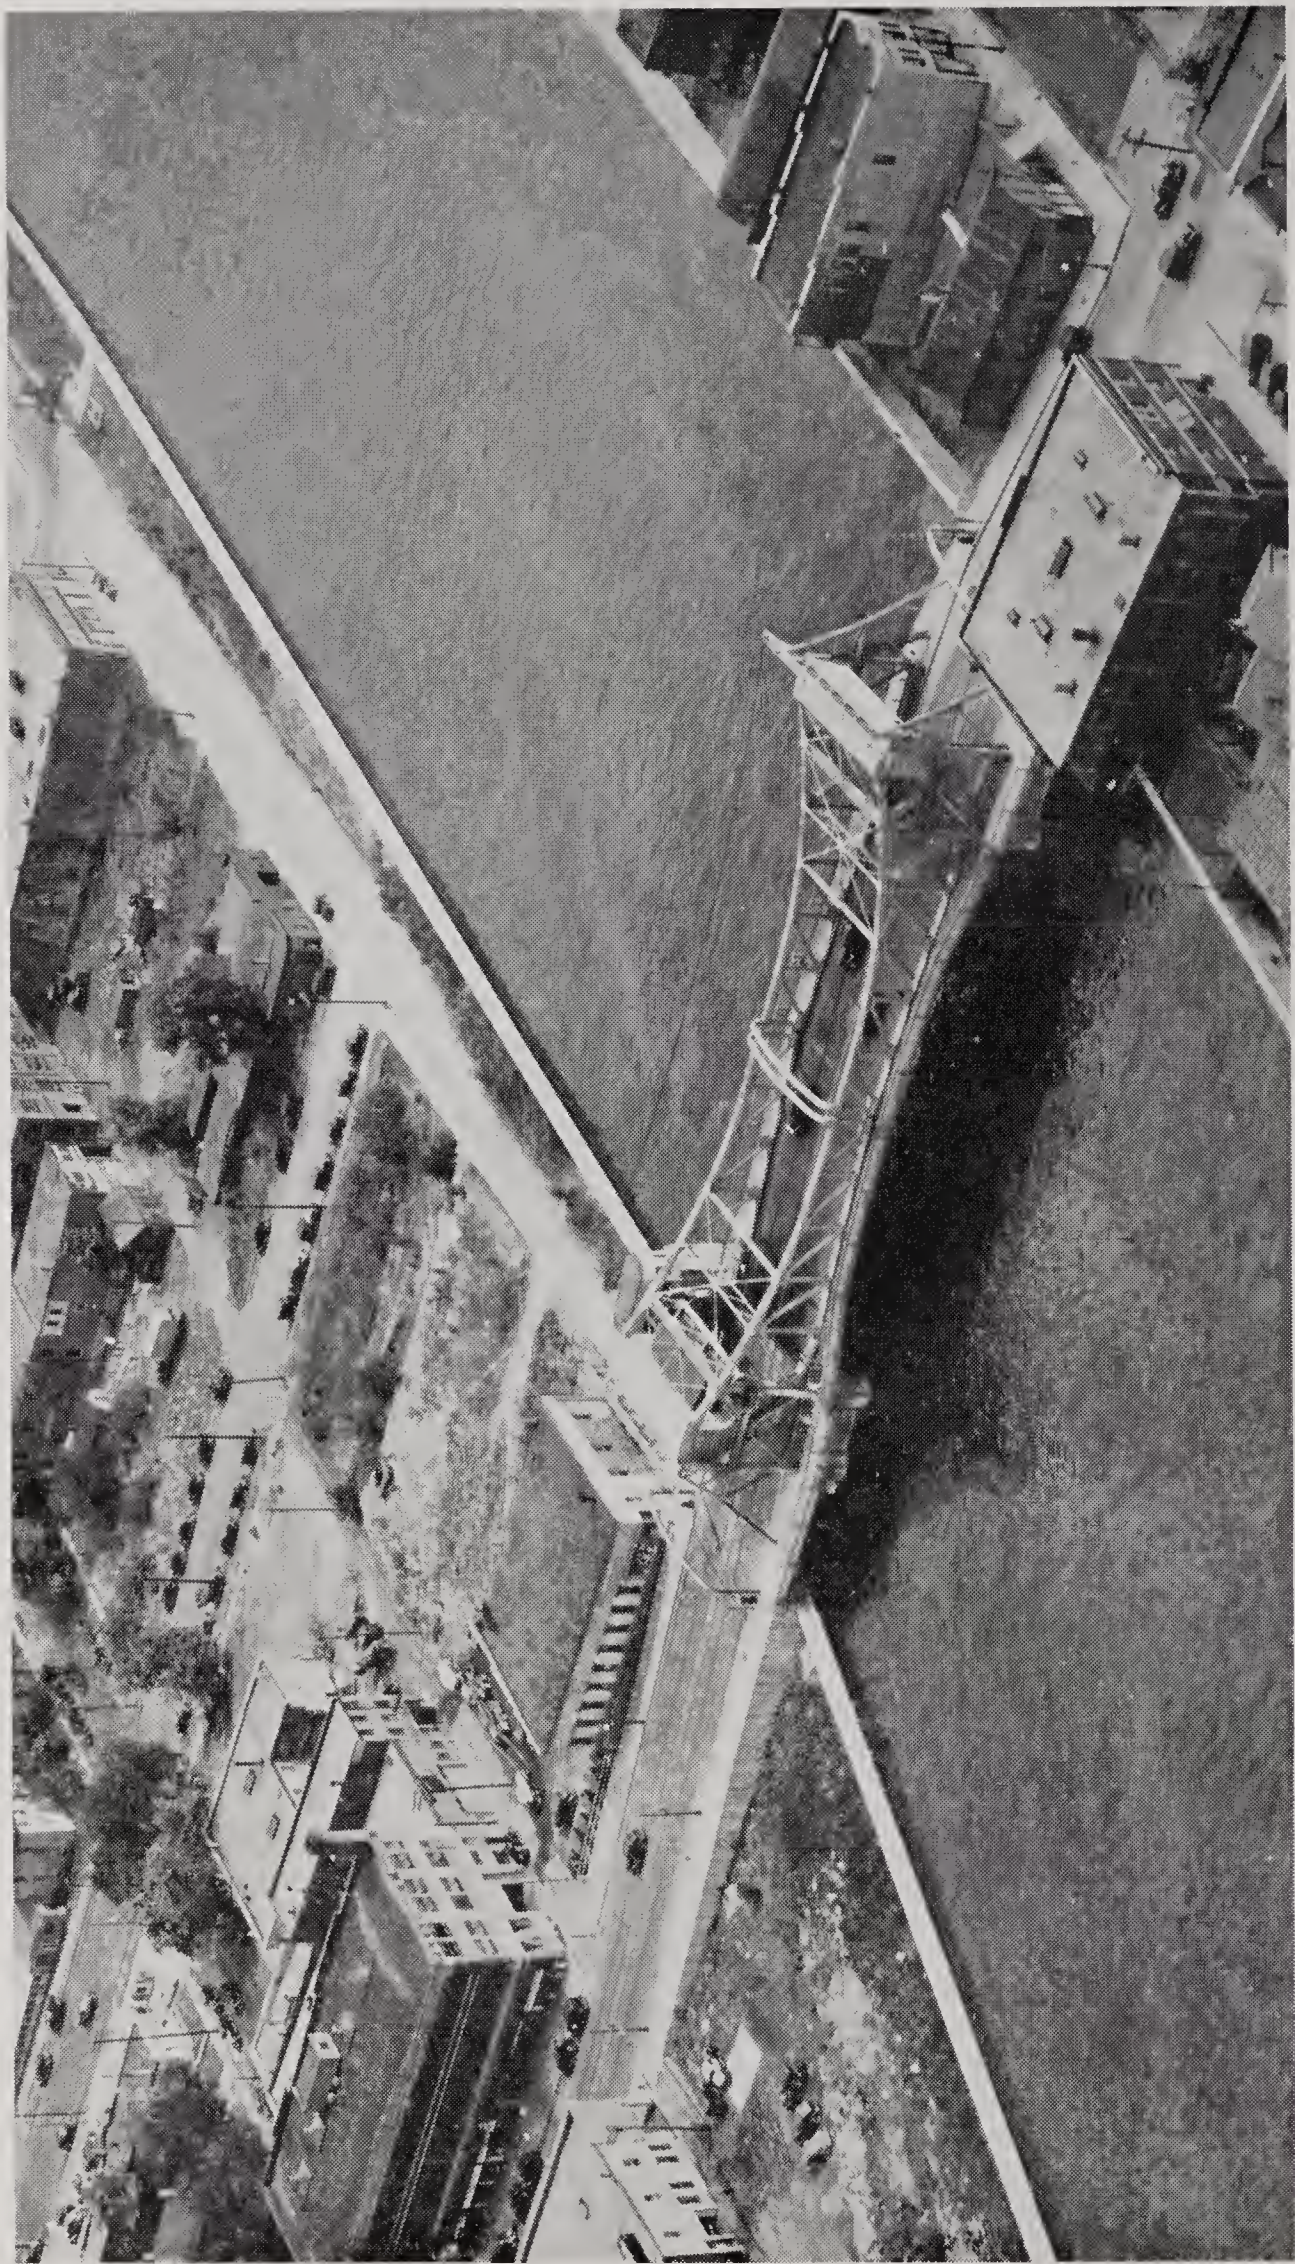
Aerial view of Cass Street Bridge looking south at Joliet.
